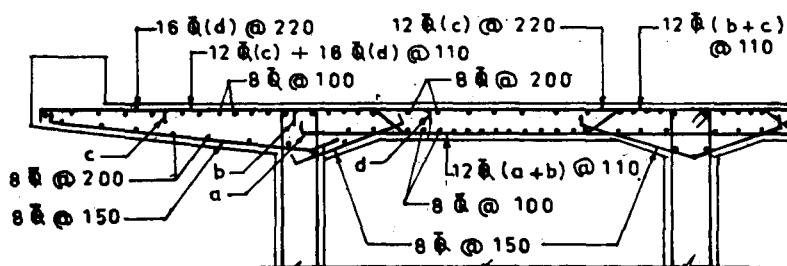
DETAILS OF REINFORCEMENT IN DECK SLAB
